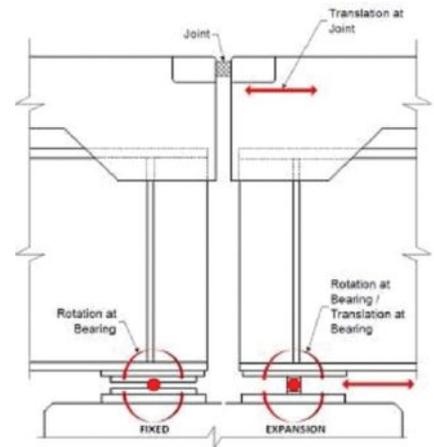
Typical deck joint at pier with movements indicated at deck and bearings.
